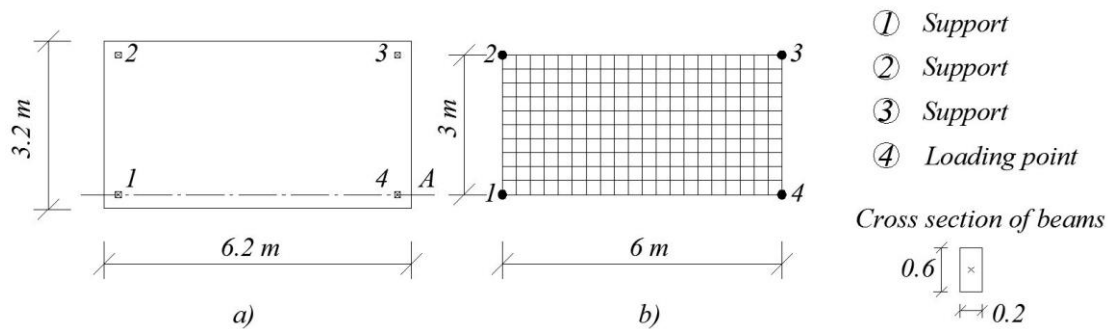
Geometry of the a) shell element model and b) beam grillage model of the rectangular slab with rectangular beam cross-sections.
